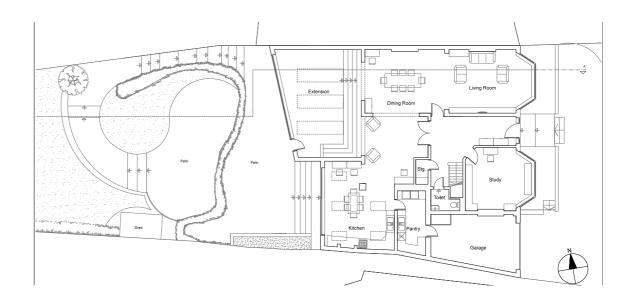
Proposed Ground Floor Plan - 227 West Heath Road
